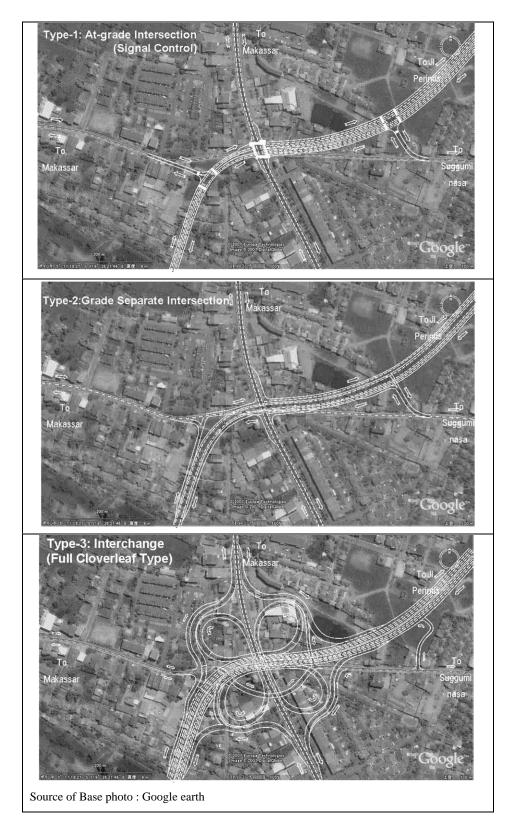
(2) Alternative Intersection Plans for TS-2 IC
